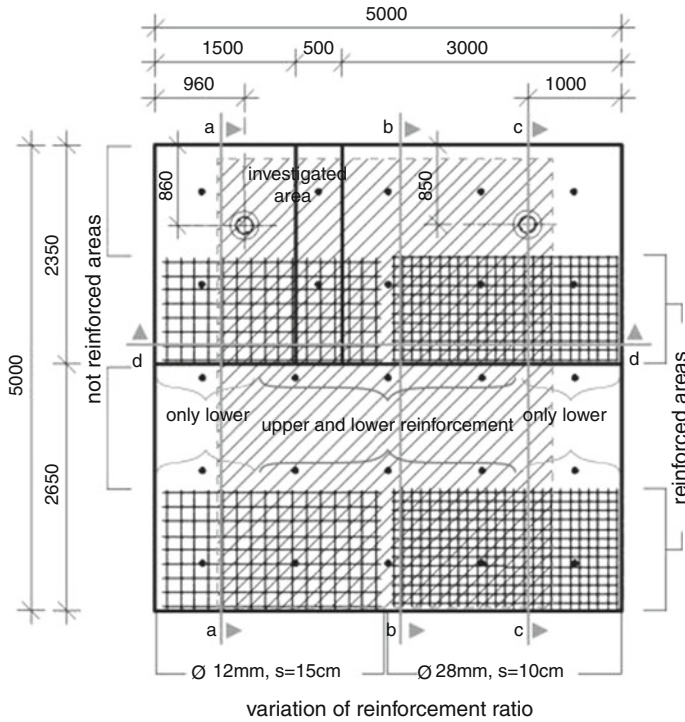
Investigated section of the foundation slab including pile heads and strip foundation
